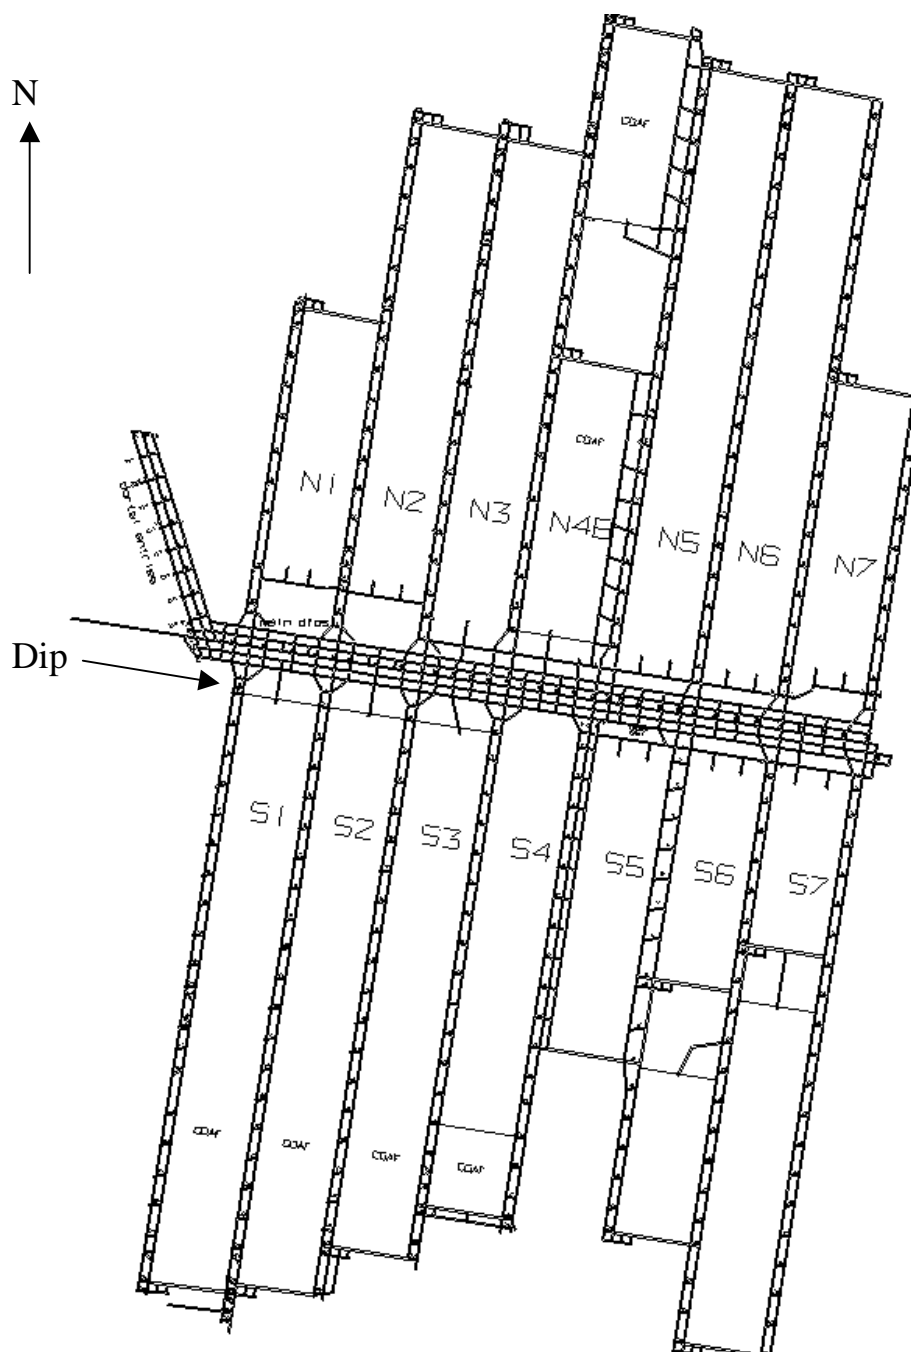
Mine layout at the field site, Newlands Colliery.
